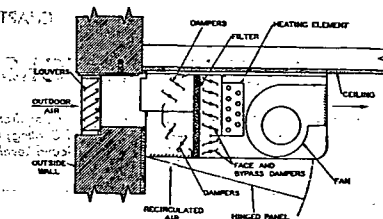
Typical Ceiling-Mounted Unit Ventilator
